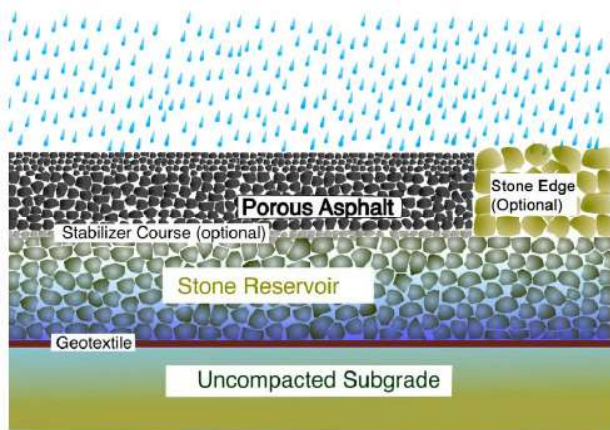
Typical porous asphalt pavement with stone reservoir cross section
